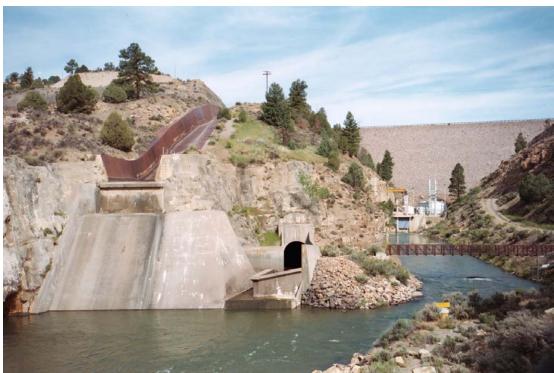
Photo of the Outlet Works at El Vado Dam
